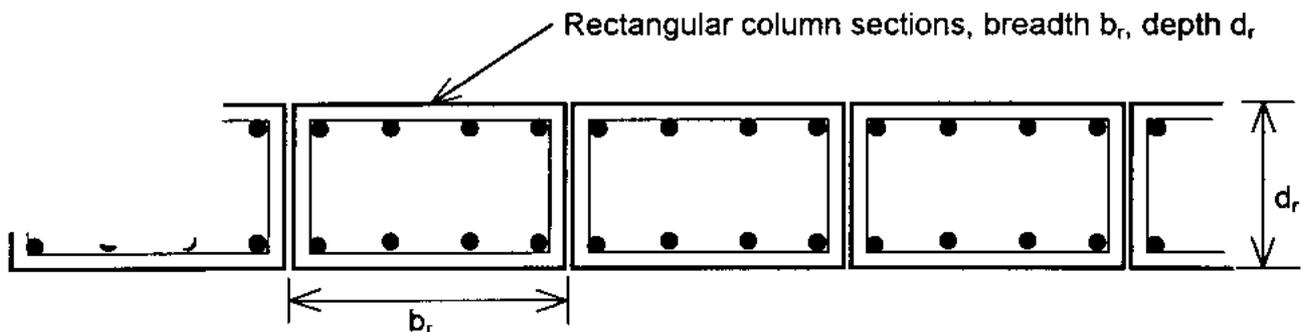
Secant Wall, Effective Size of Female Pile
